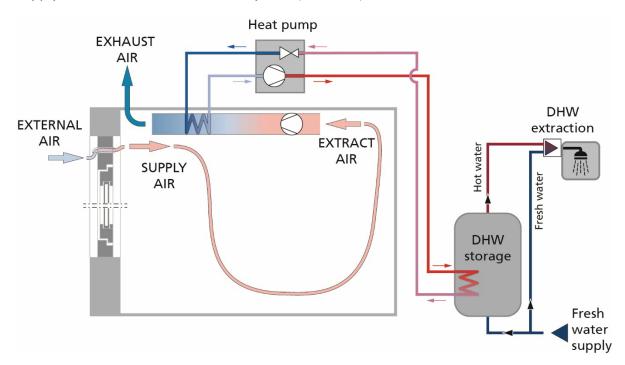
Exhaust air heat pump connected to the domestic hot water storage.
